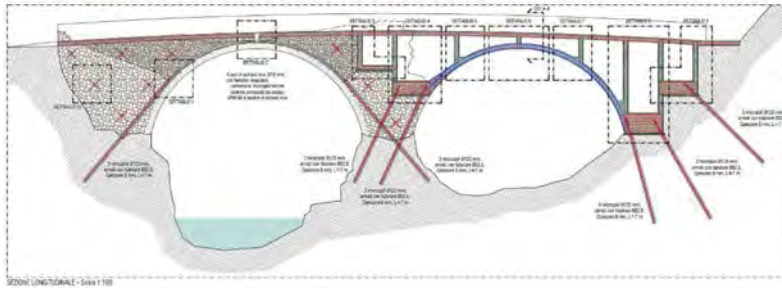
Structural restoration with cable layout and anchoring, and new bridge span.
